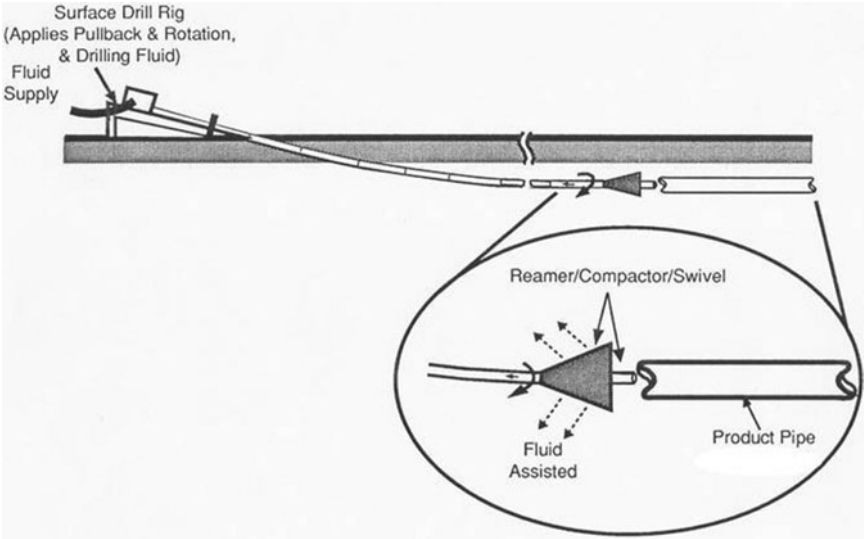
Mini-Horizontal Directional Drilling, Pullback Phase (Courtesy of Outside Plant Consulting Services).
